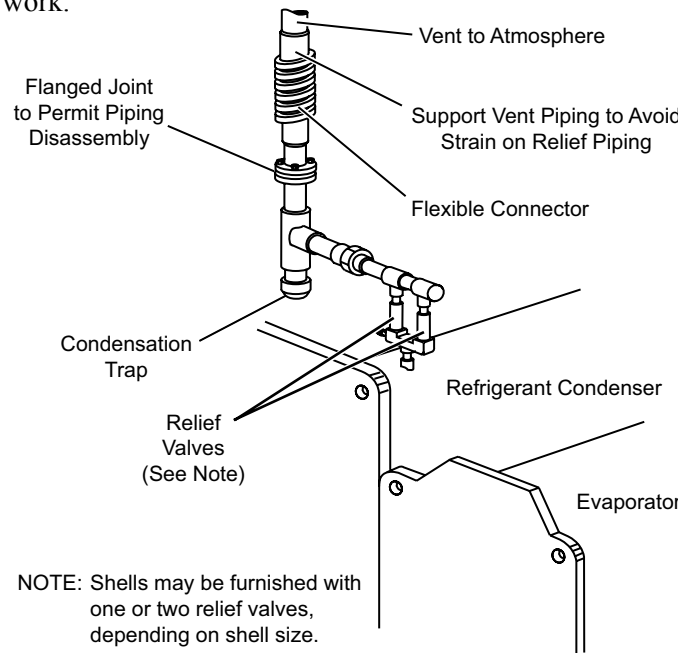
TYPICAL REFRIGERANT VENT PIPING
